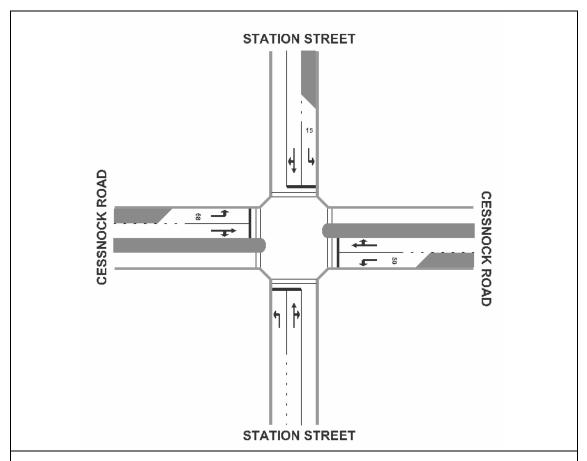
Intersection Improvements – Case 1(Cessnock Road/Station Street)
